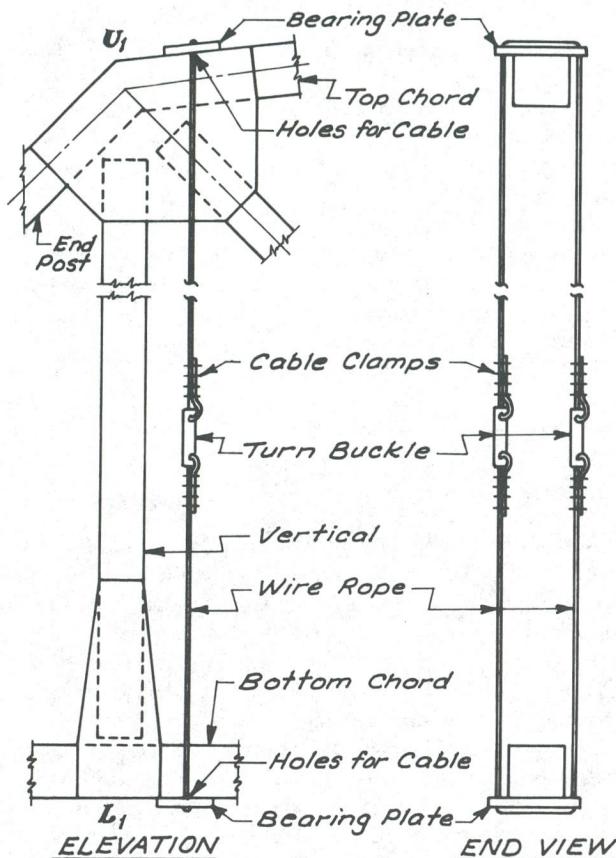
Auxiliary support for repair of truss vertical, tension member.
